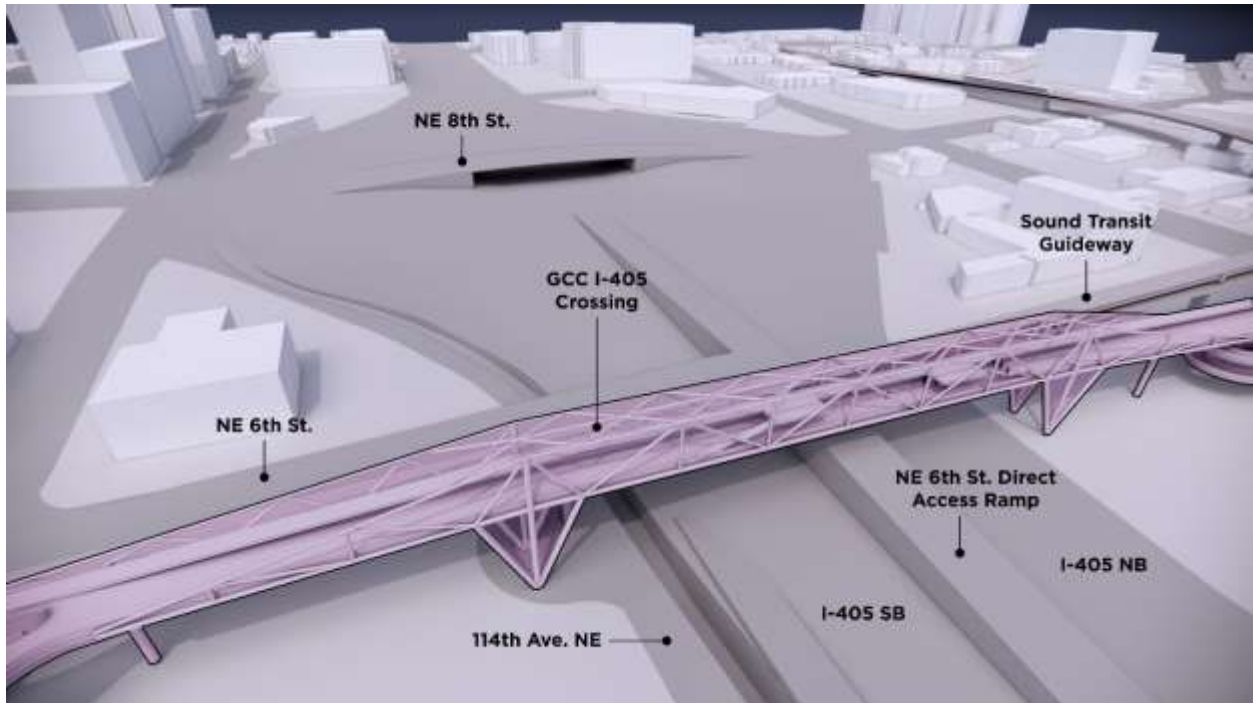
Conceptual rendering of the I-405 crossing structure, steel truss alternative (looking north).
